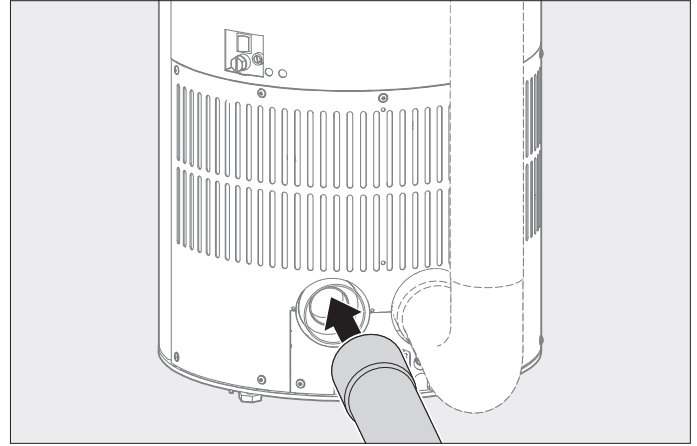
Plug the Ø 80 mm combustion air line into the rear
